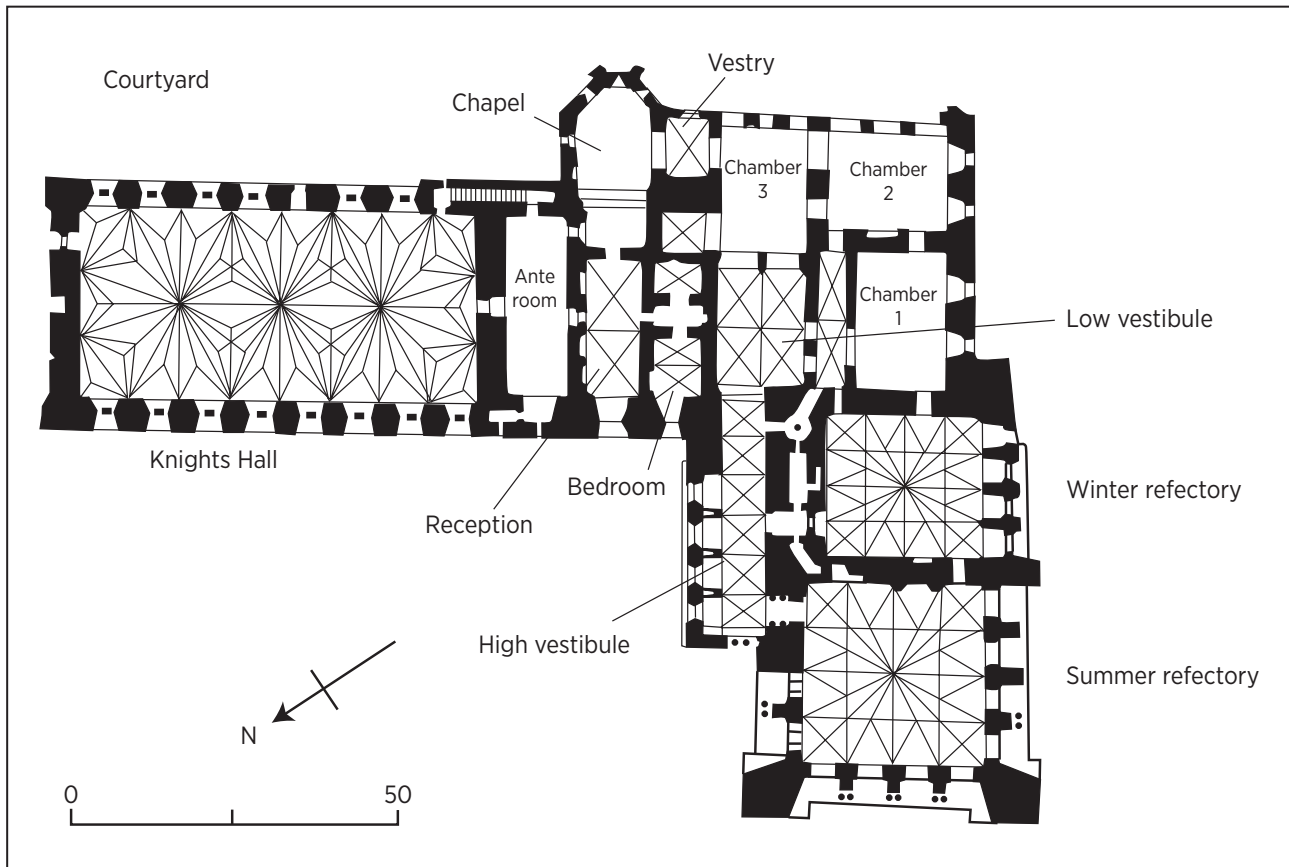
Malbork Castle: first floor plan of Grand Master's Palace
